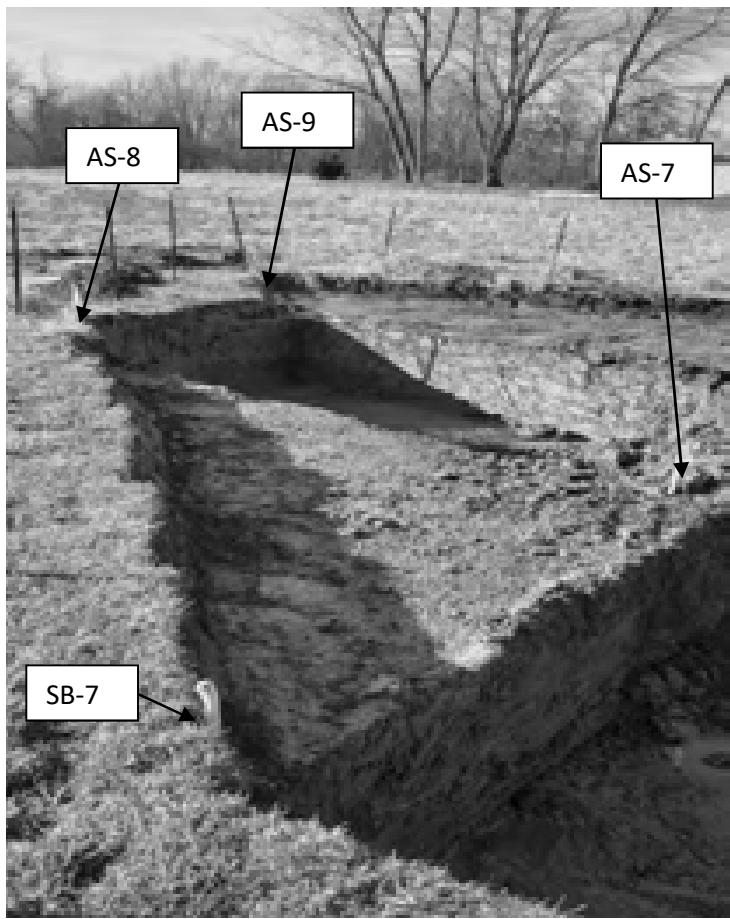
Southern end of REM-1. Shows 1 ft. excavation between SB-7, AS-8 and AS-7 (in foreground). Excavation down to 4.5 ft. between AS-8 and AS-9.
